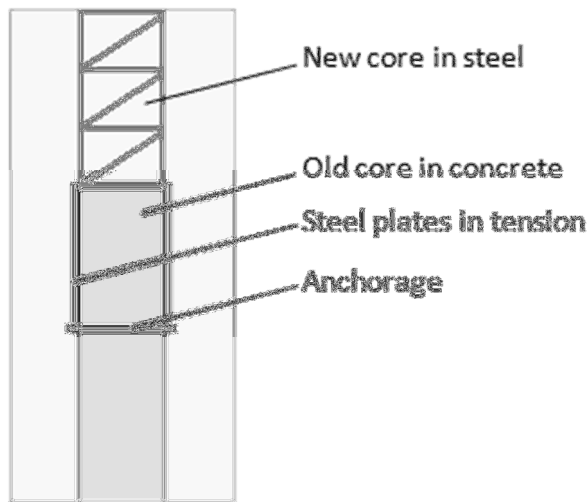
, Simplified sketch of the reinforced bracing in Gothia Central Tower.
